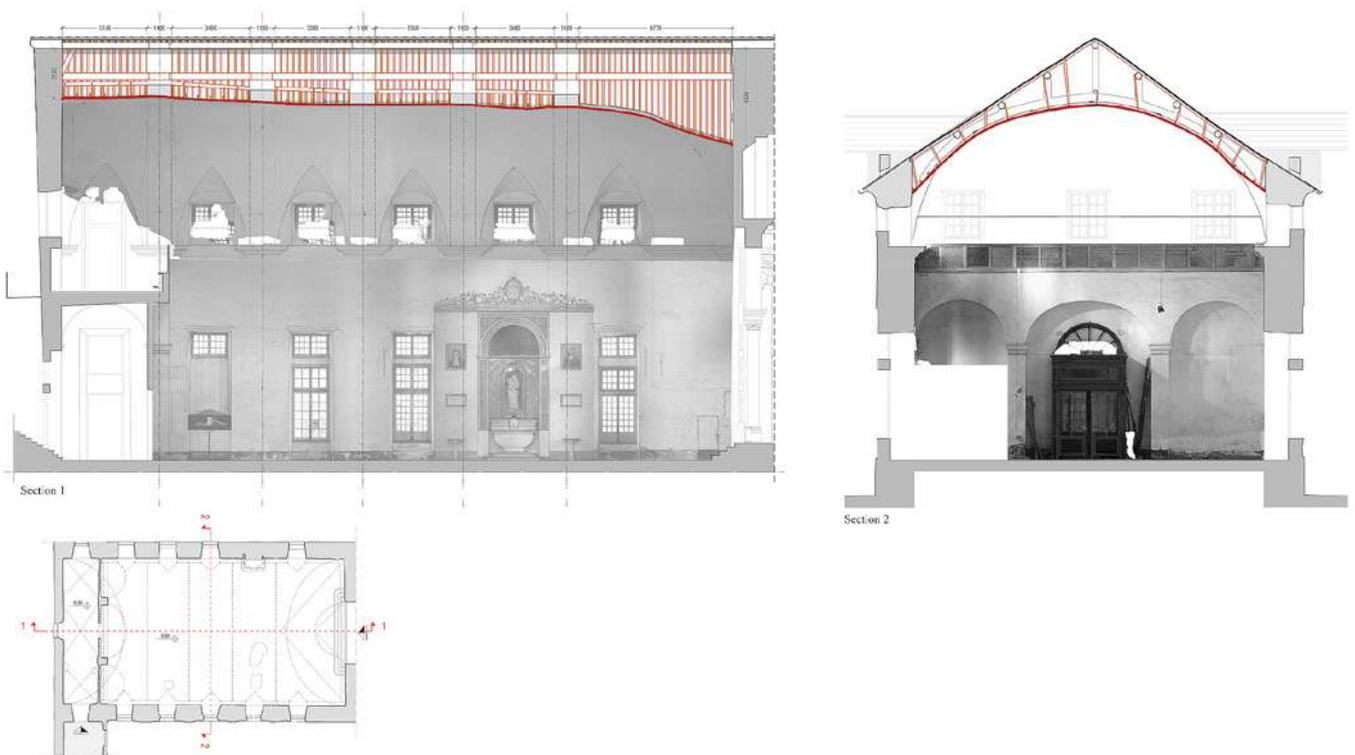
The roof structure's current configuration; longitudinal and cross sections.
